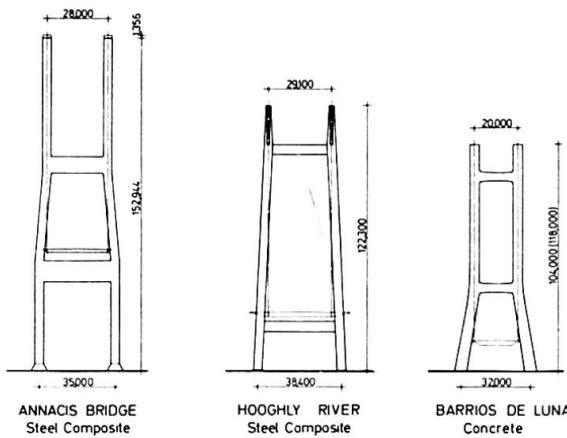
Tower shapes for recent long-span cable-stayed bridges
